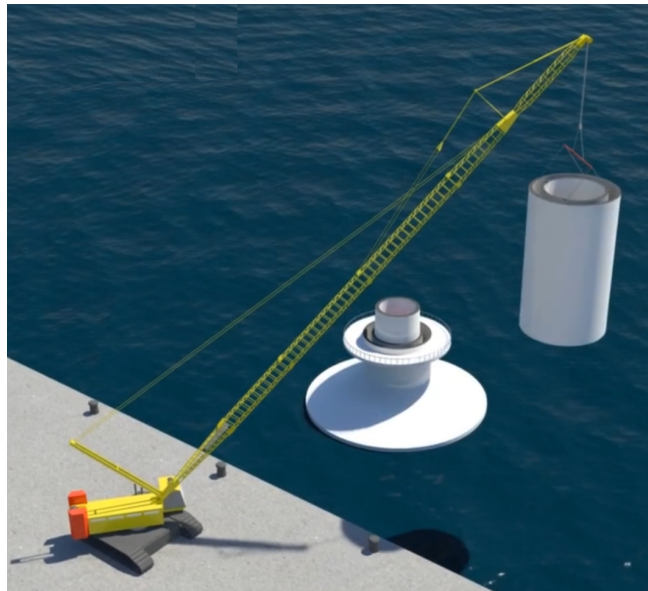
Typical construction site layout. Adapted from [22].
